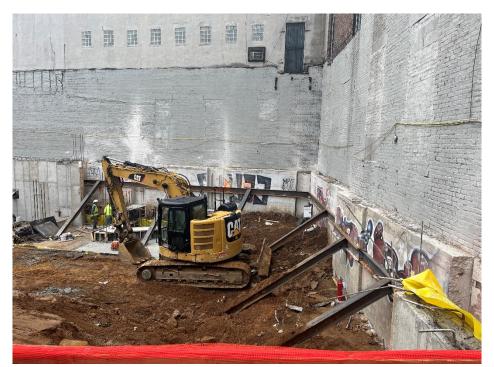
View of contractor preparing for SOE installation along southern portion of Site, facing east.
